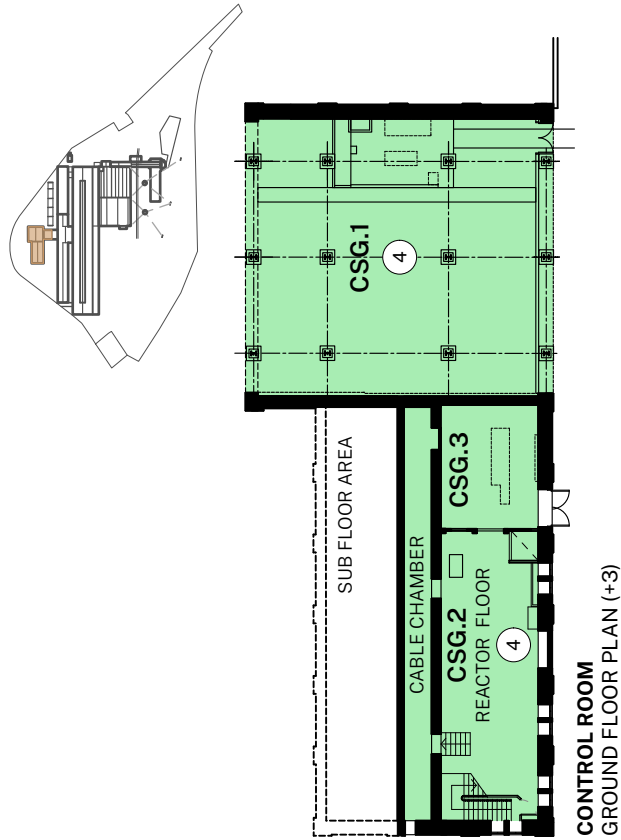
Gradings of significance: Control Room Building plans.
